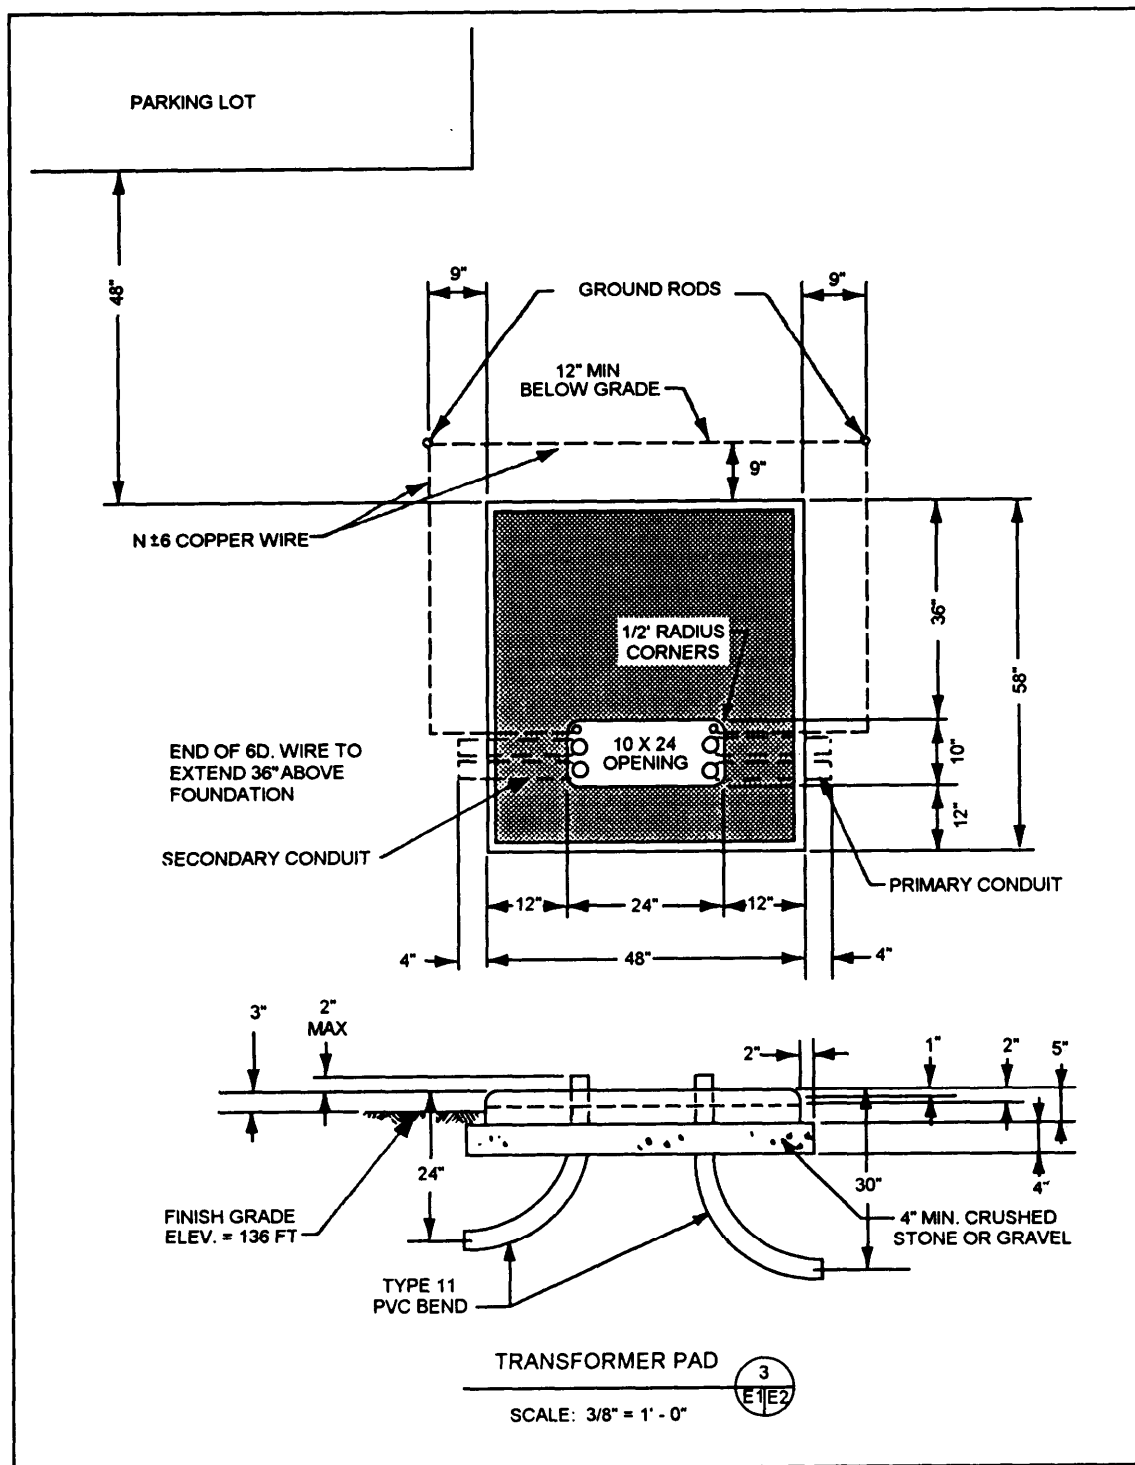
Transformer pad details for use with the site plan shown in figure 2-15.
